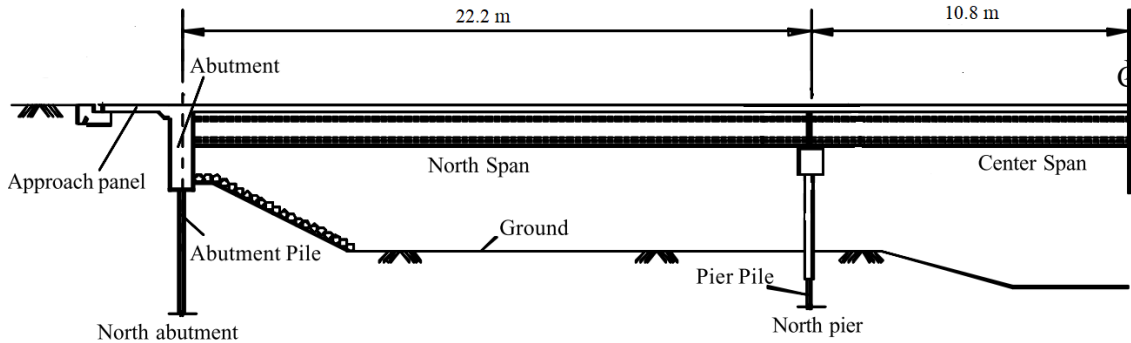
Bridge #55555 Elevation (after Huang et al. 2004)
